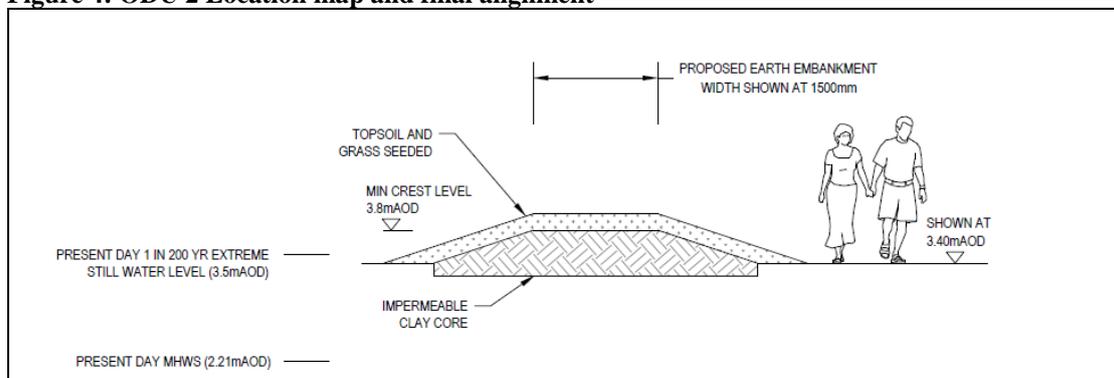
Sketch showing indicative earth embankment cross section (not to scale) in south section of ODU 2b
